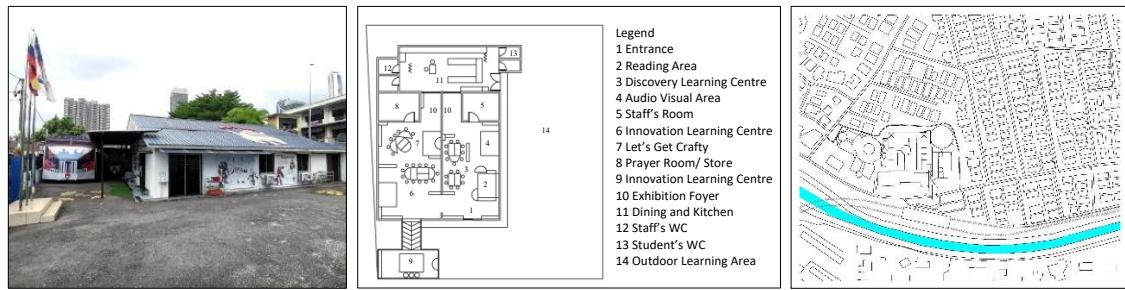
(Left) Tabika KEMAS Keramat Nur Parlimen Titiwangsa; (Middle) Layout Plan; (Right) Location Plan
